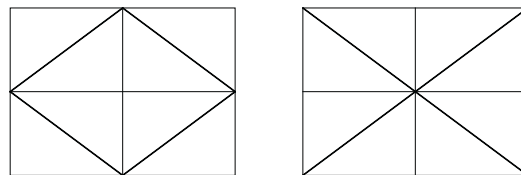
K-braced (left) and X-braced (right) truss girder outriggers
